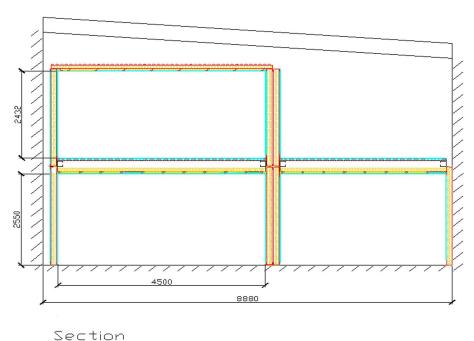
Full scale three room test facility for sound and vibration evaluations.
